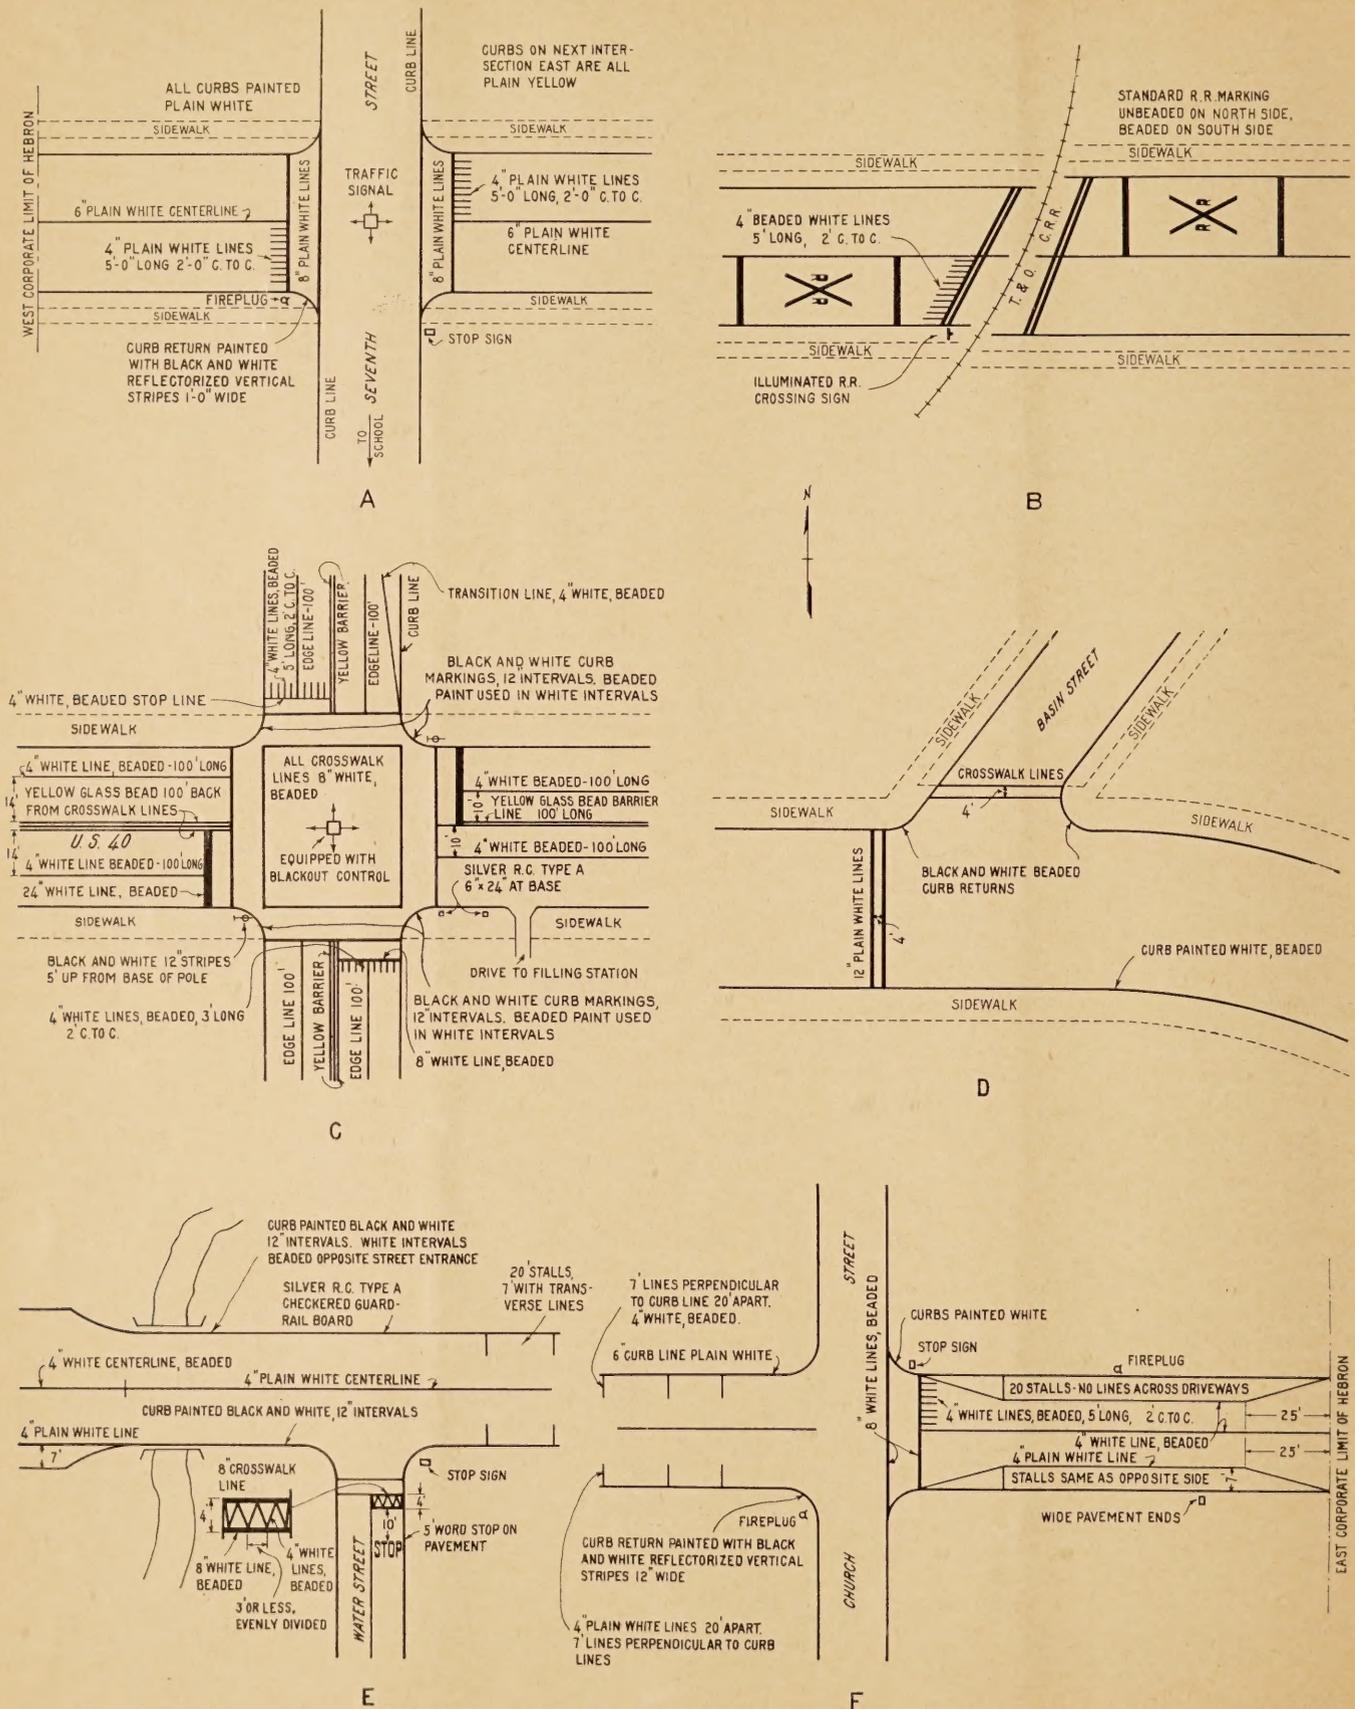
PAVEMENT AND SPECIAL MARKINGS ON URBAN SECTION OF TEST ROUTE.
